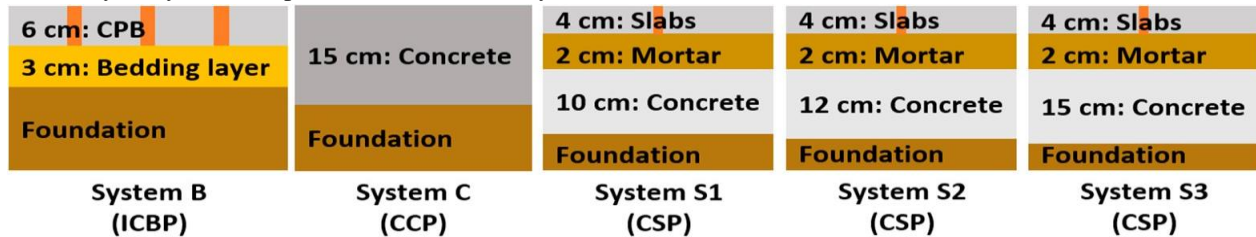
Pavement systems B, C, and S1–3 (adapted from [127]).
